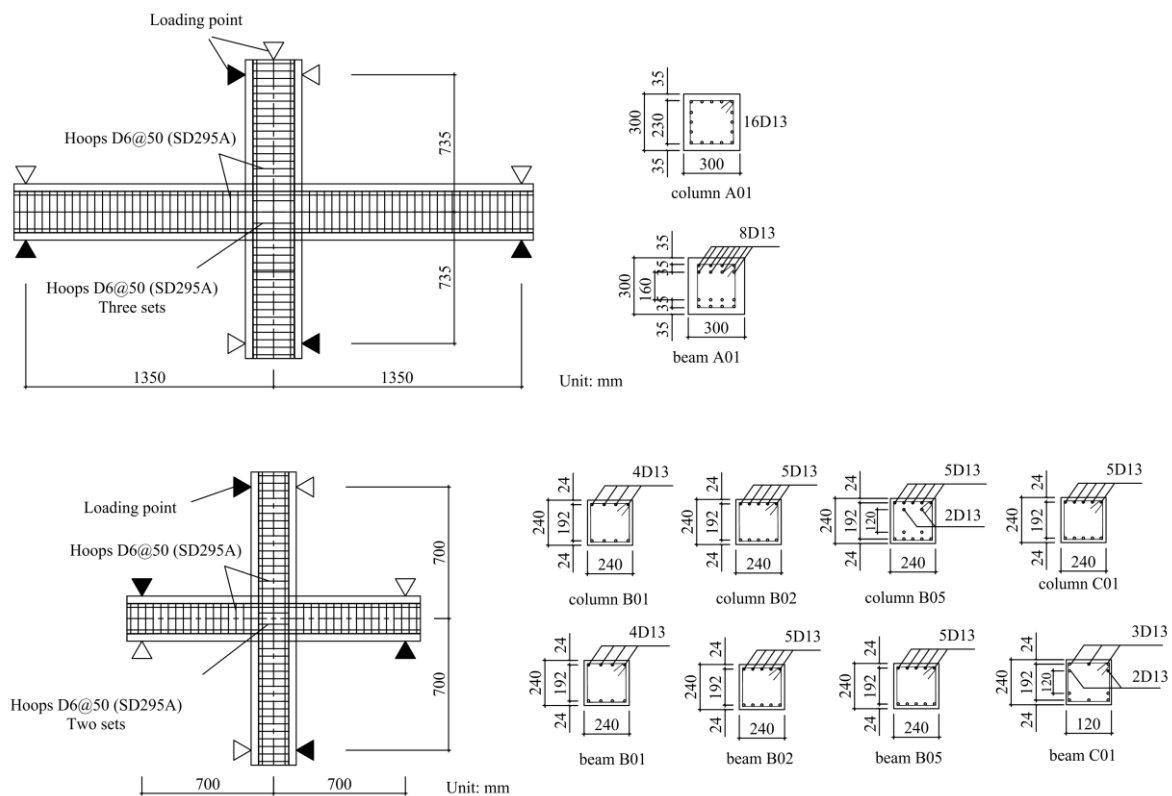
Test specimen of interior joints specimens with identical depth of beams and columns
